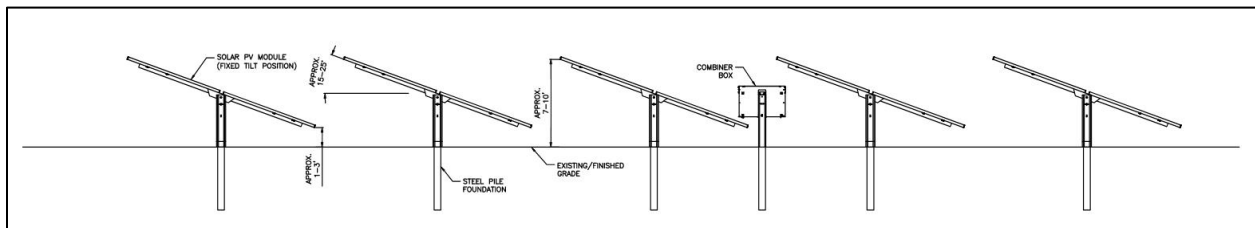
Horizontal Fixed-Tilt Racking Solar PV Typical Elevation View
